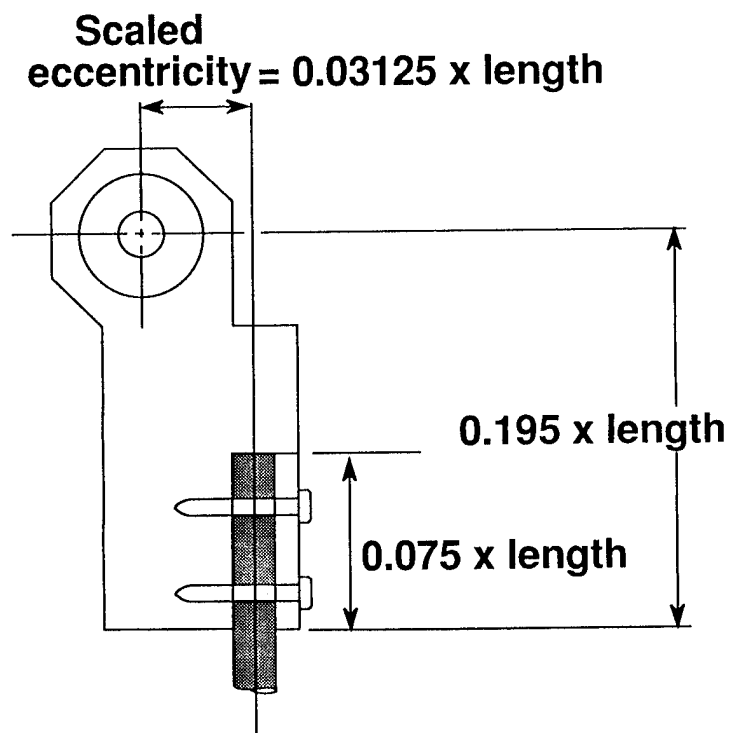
Detailed drawing of the hinge-beam attachment.
